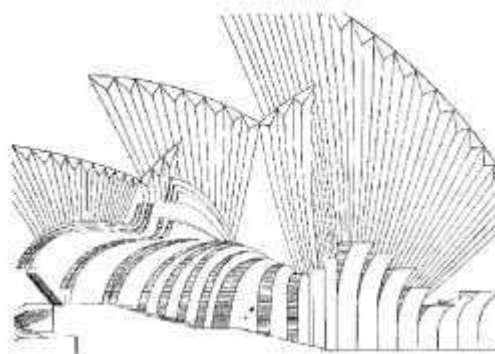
Second design of Minor Hall. Longitudinal section (showing interior elevation).
